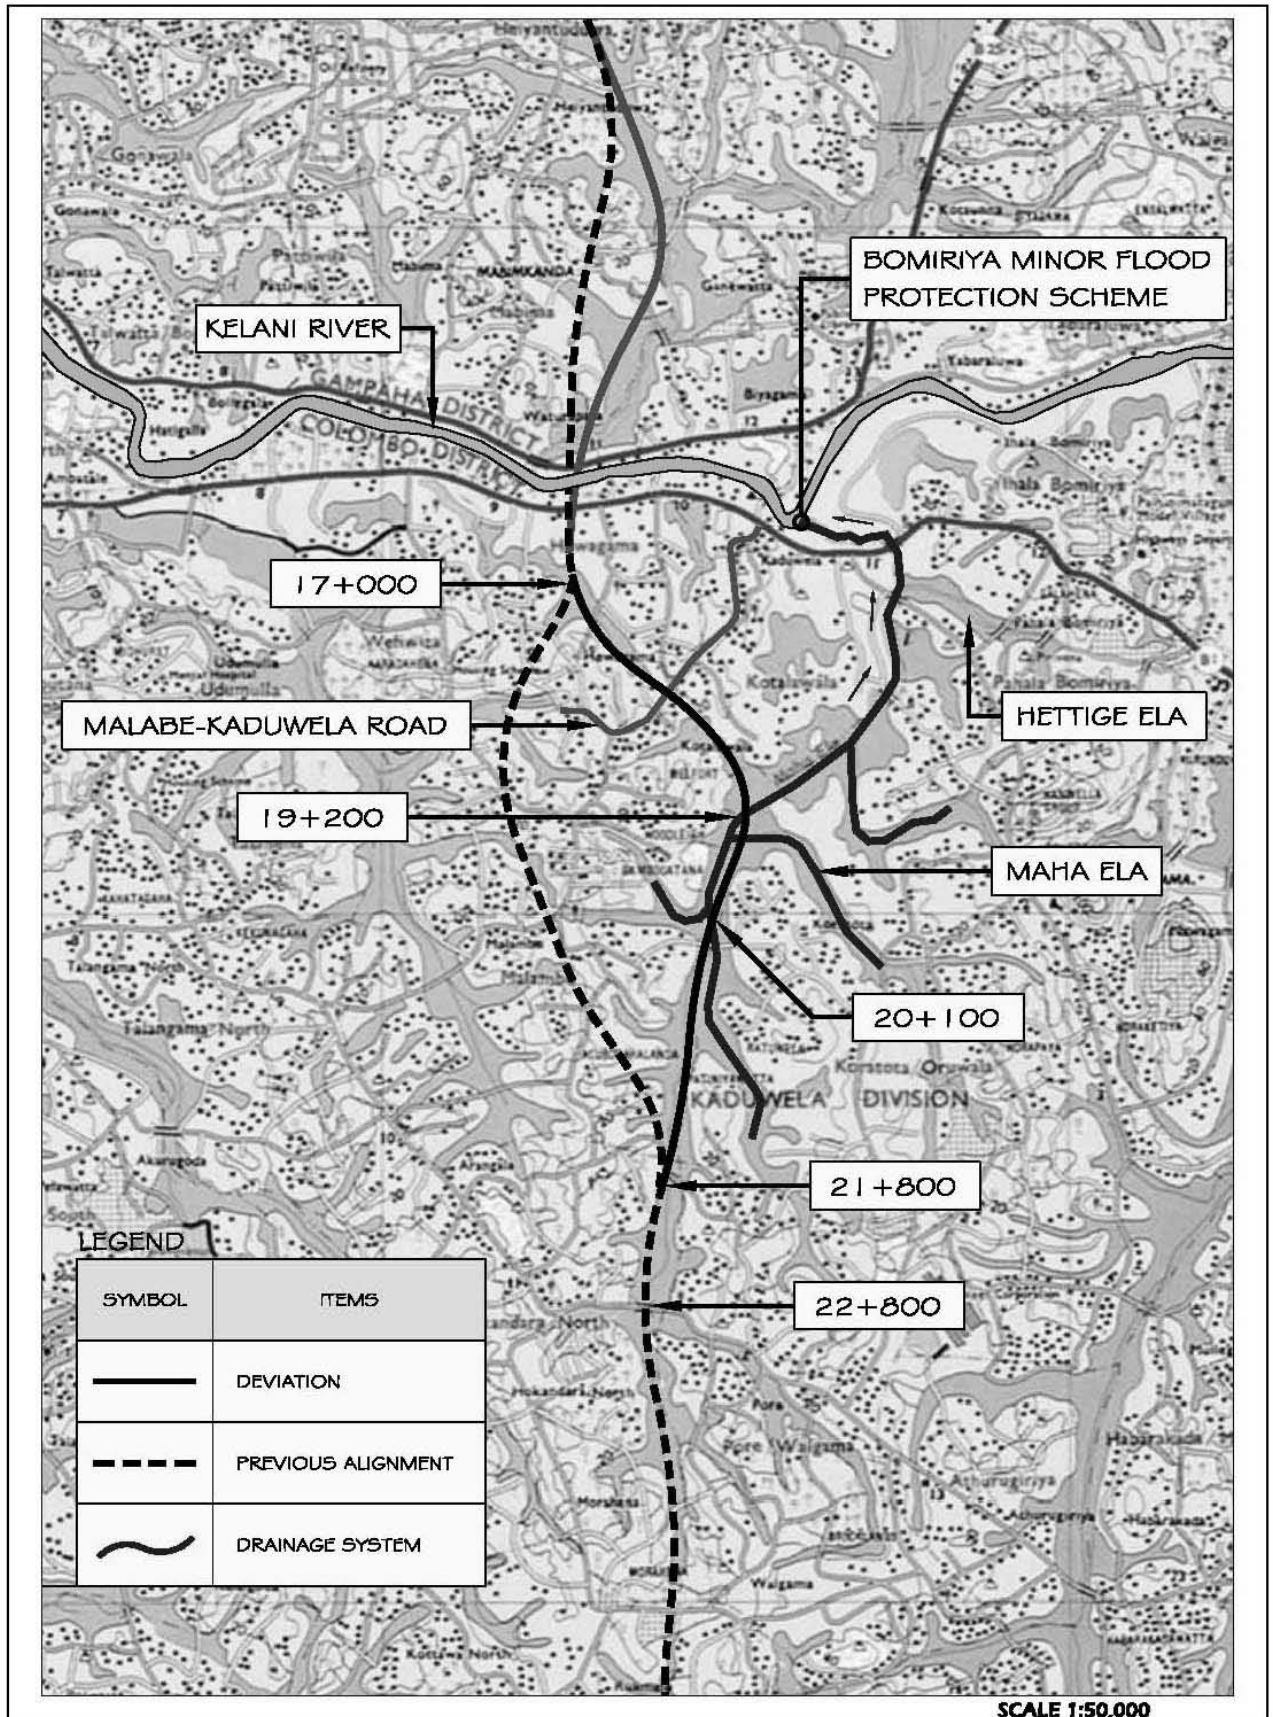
EXISTING DRAINAGE SYSTEM
